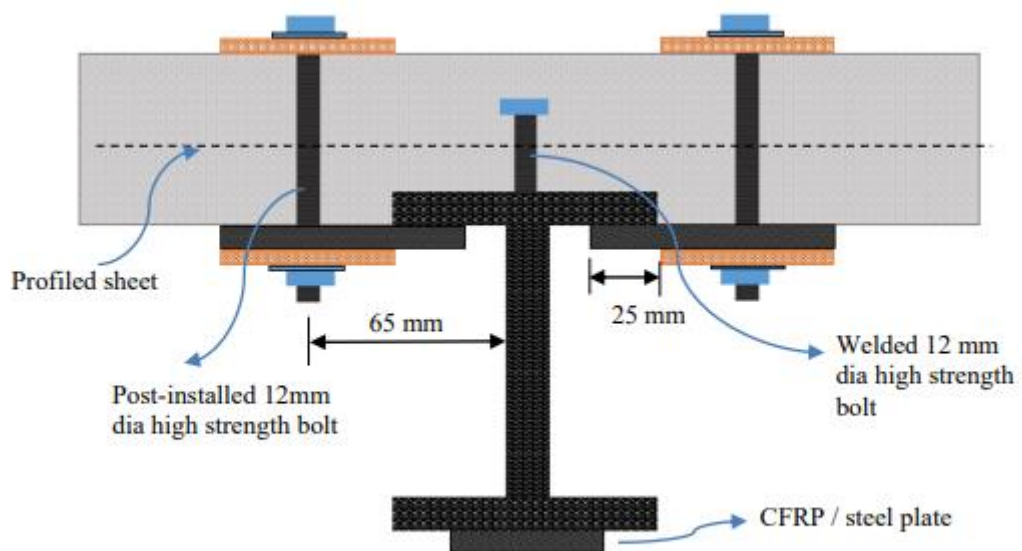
Flexural and longitudinal shear strengthening of steel-concrete composite beam with profiled sheet
